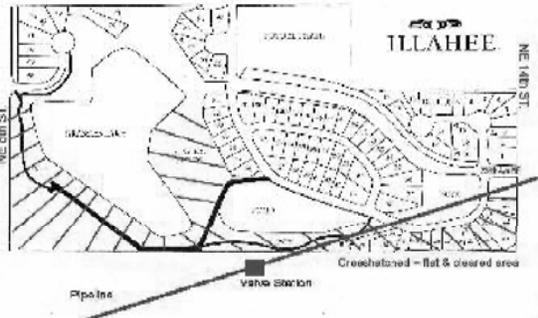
Proposed Alternate Site for Proposed Temporary Work Area
